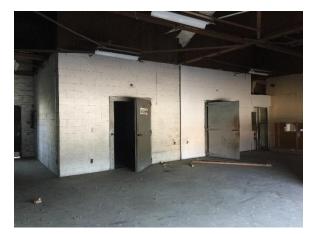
Example view of vendor area & walk-in cold storage units, Warehouse #1 (Building 1).
